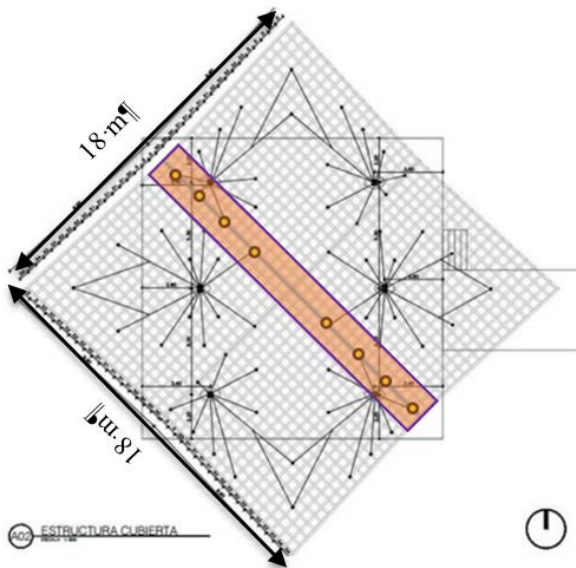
Plan view of Las Garzas roof with tributary area highlighted
